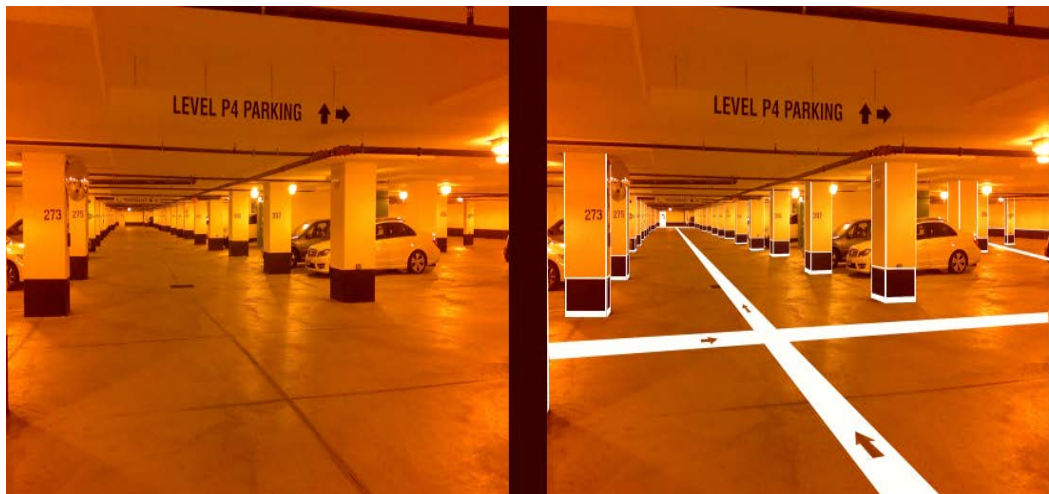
Underground parking and tenants storage units area level -4 Arc Condominiums Building – Toronto
